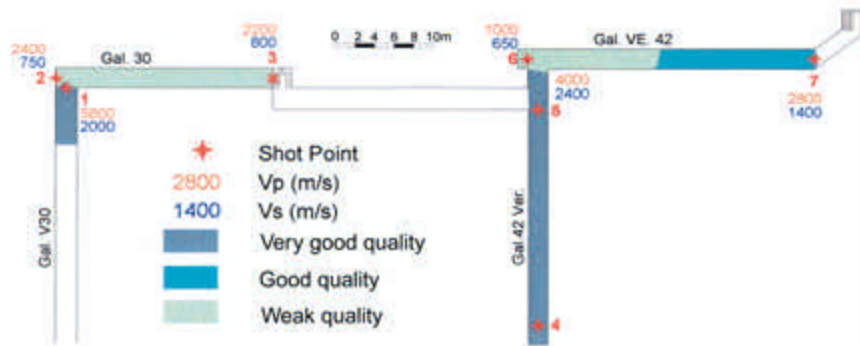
Quality of concrete in galleries according to seismic investigation 0.5 m under the gallery floor. Concrete section of Qyrsaqi dam.
